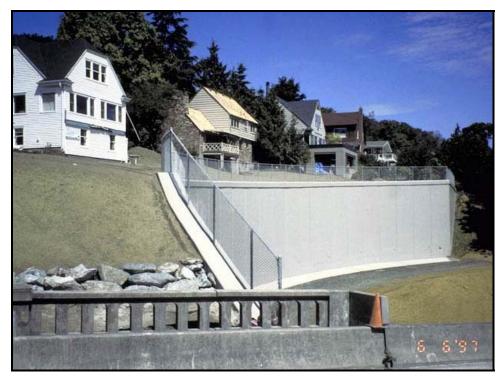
Repair of landslide in Figure 17, showing reconstructed slope and large retaining wall. [*Photo: 6/6/1997, #4108_15*]
